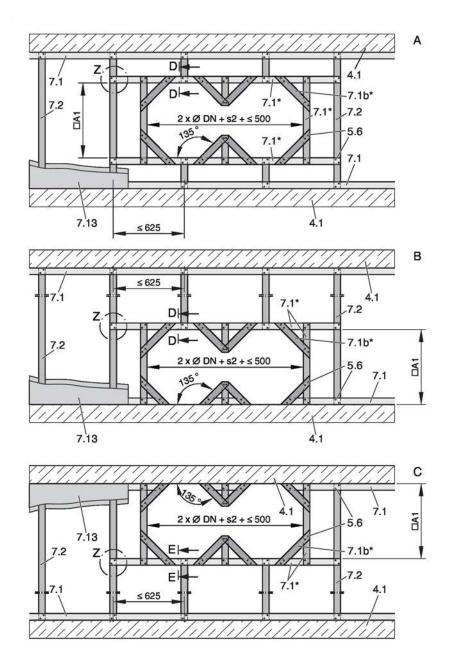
Lightweight partition wall with metal support structure and cladding on both sides, flange to flange, \varnothing nominal width 450 – 800, caption % Fig. 33
